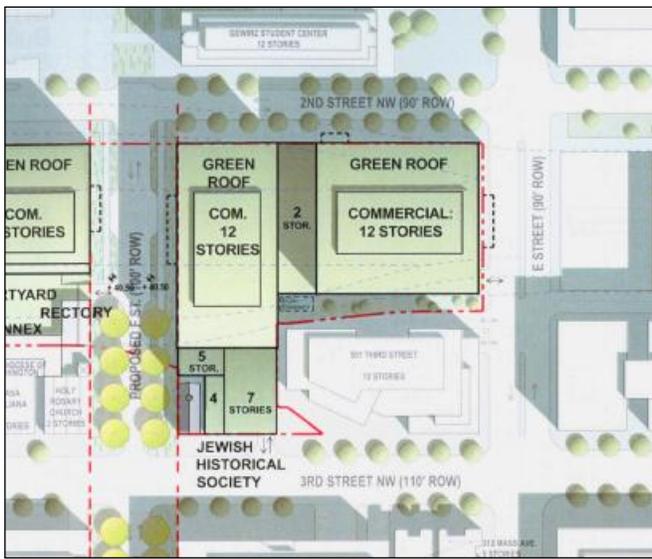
Approved Plan for the South Block site, looking east across 3<sup>rd</sup> Street NW.
